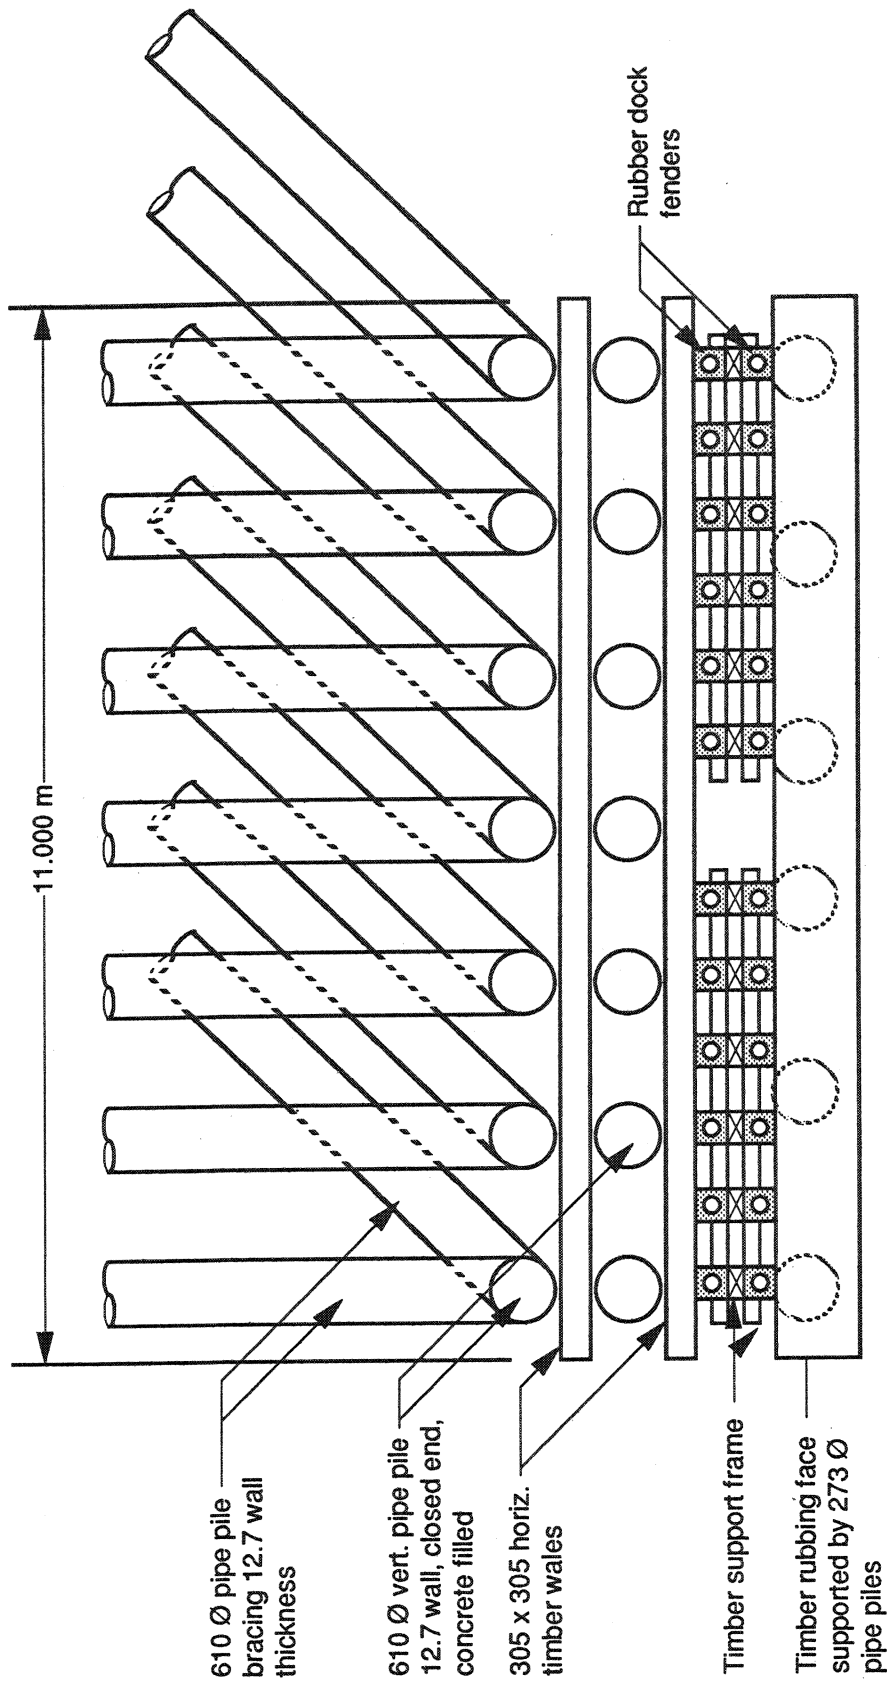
Plan of West Wingwall – Langdale Ferry Terminal, British Columbia (Dimensions in millimeters and meters)
